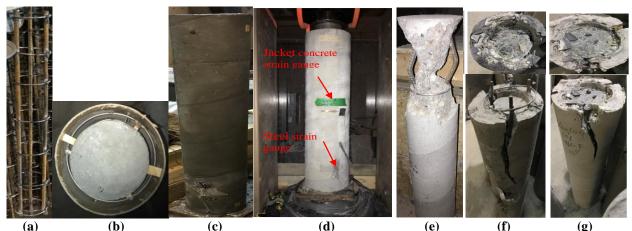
(a) Jacket reinforcements, (b) damaged SCC core pier in tube form, (c) repaired piers, (d) test setup with instrumented and failure pattern of piers (e) core (S-C), (f) jacketed UF -1.5-60%, (g) UF-2-60%
